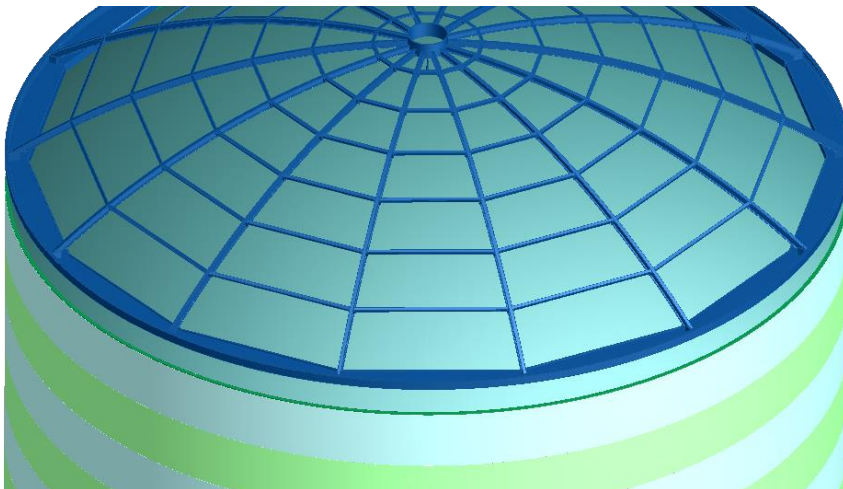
Roof-to-wall joining types as per API 650
